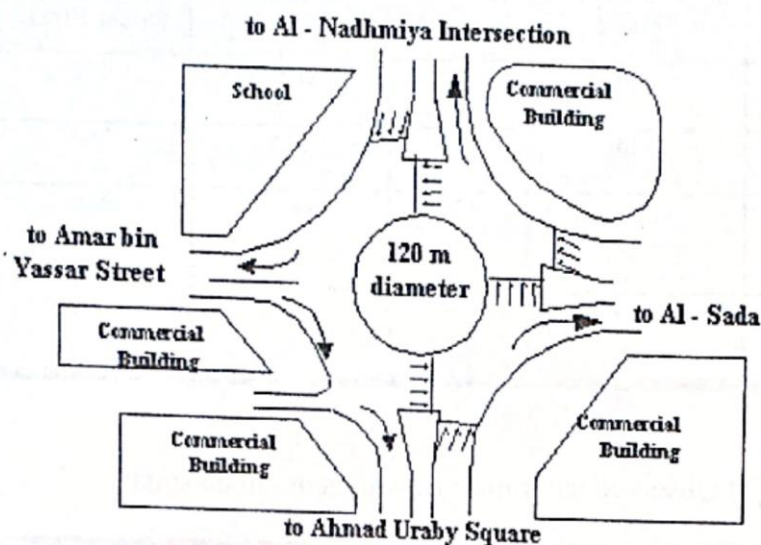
Details of geometric layout and land use of surrounding area of the studied roundabout
